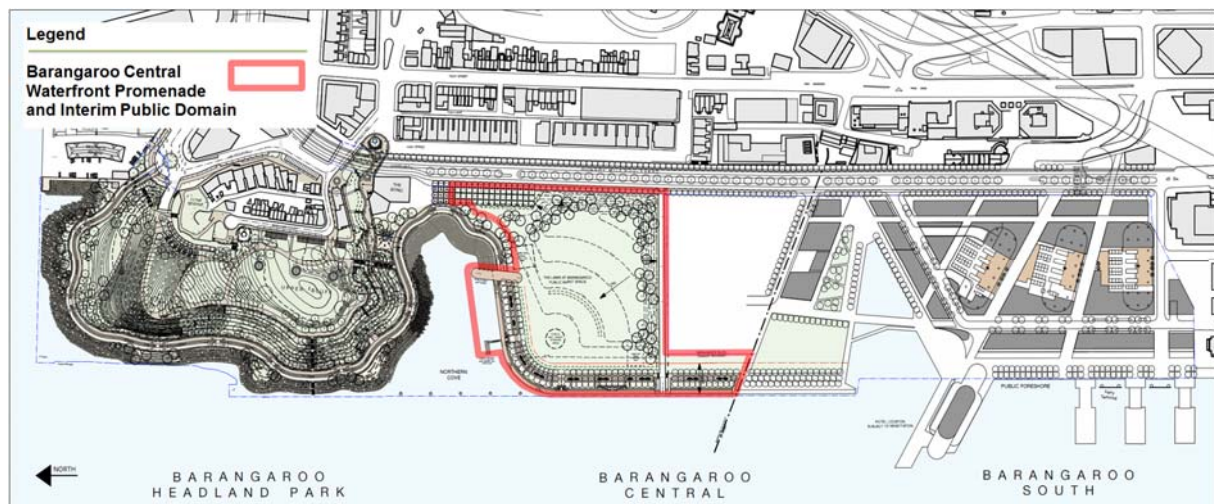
¹ Barangaroo Central Waterfront Promenade and Interim Public Domain site area
